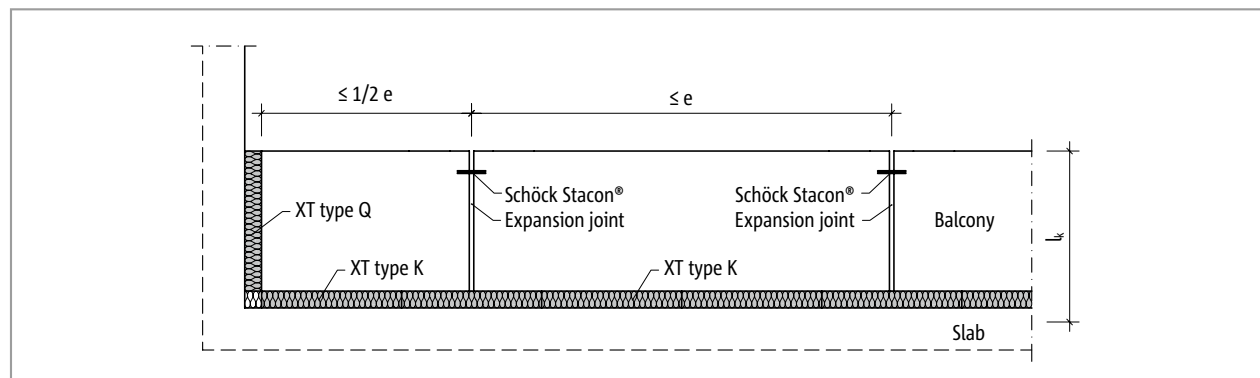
Schöck Isokorb® XT type K: Expansion joint arrangement
